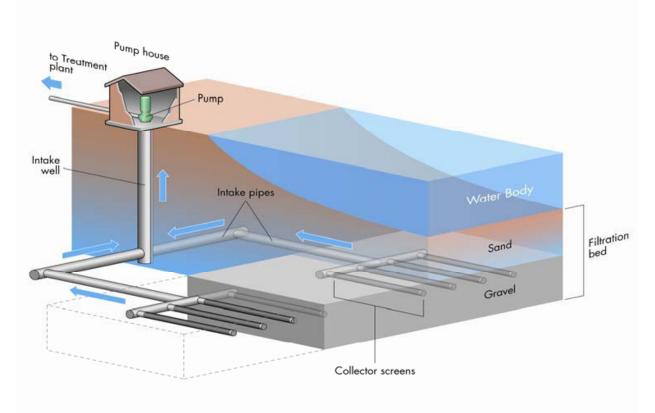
Subsurface Infiltration Gallery (Fukuoka Type Intake)
